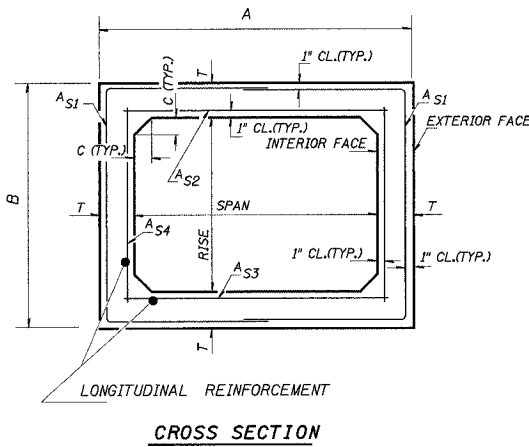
# DETAIL OF PRECAST CONCRETE BOX CULVERT END SECTION
